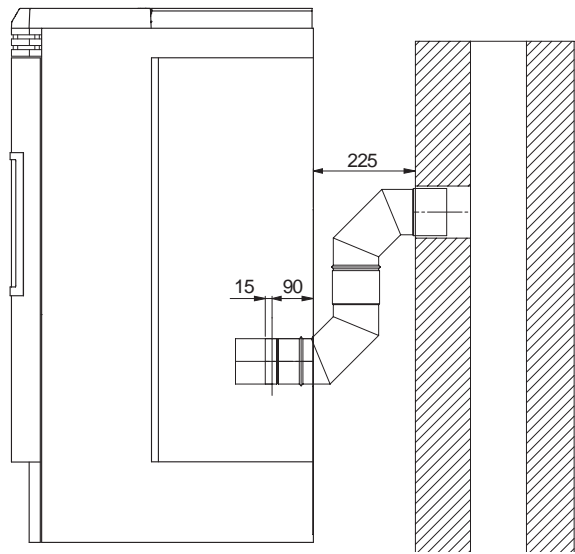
FireWIN flue gas connection – exhaust pipe connection with 2 x Bend 90° rigid
